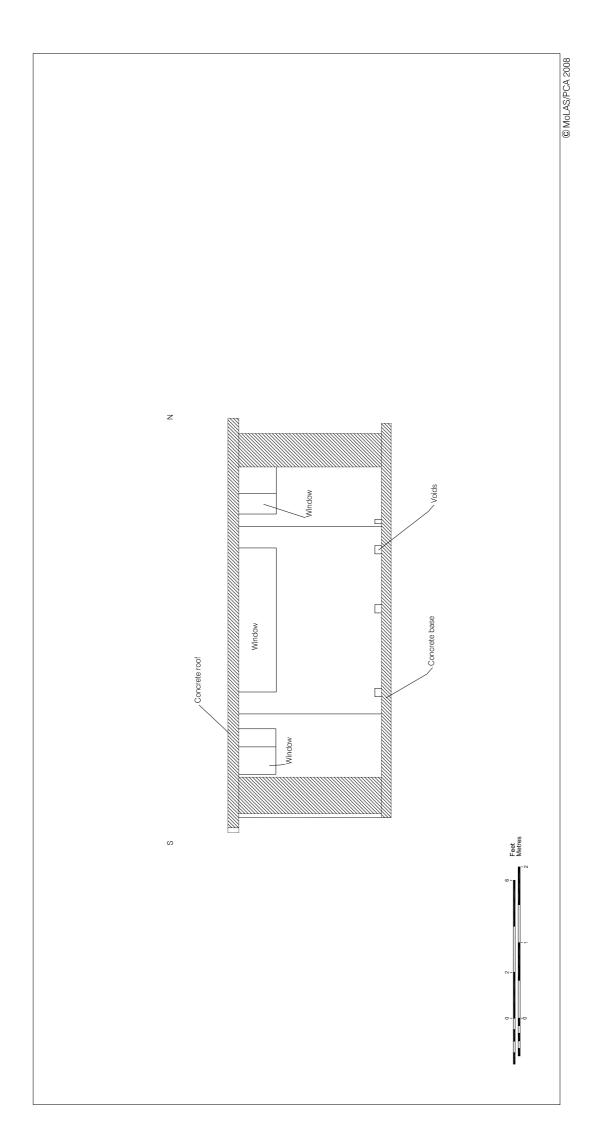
Building 7, pillbox, west elevation 1:50 at A4
